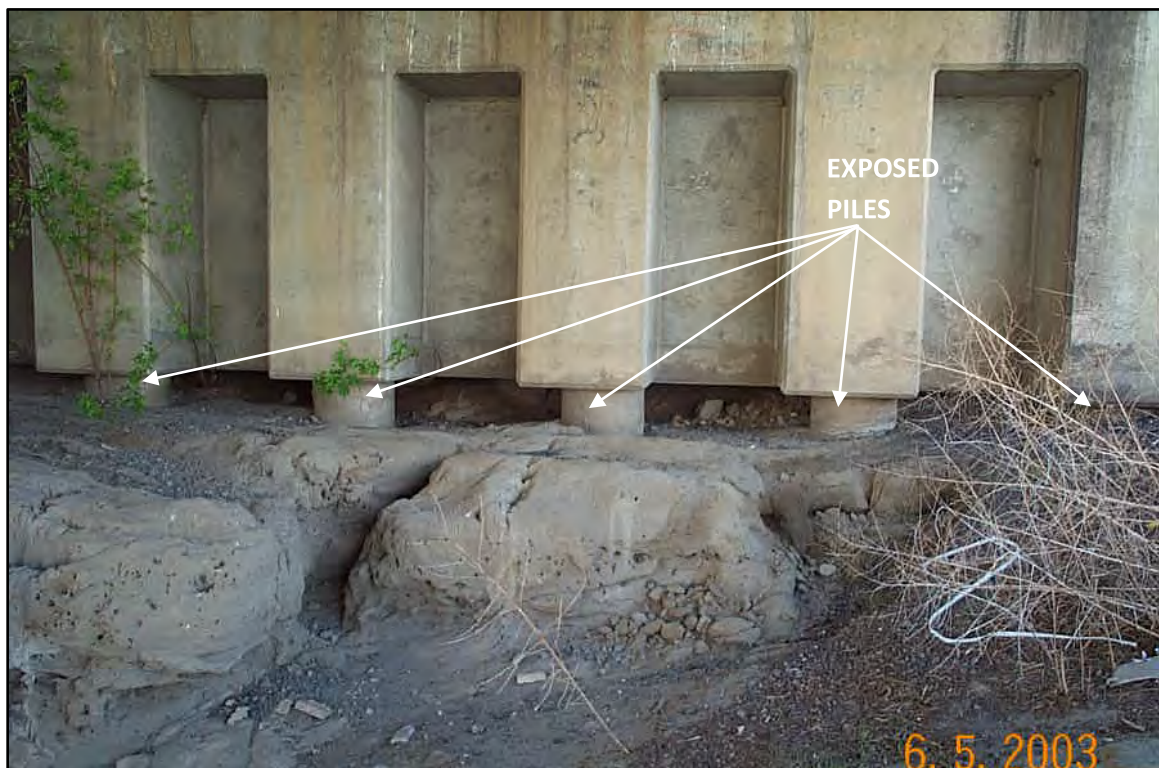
South Abutment of the SR 241 Yakima River Slough Bridge (241/2)
